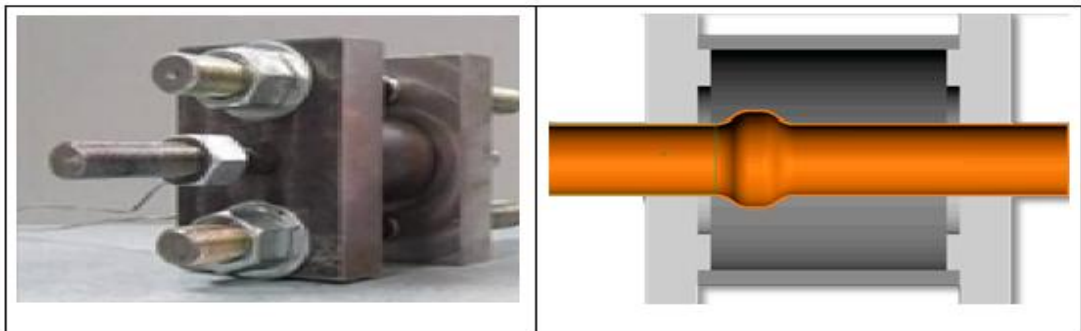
Lead extrusion damping device a) Size of The HF2V device, b) Shaft with bulge that passe [49].
